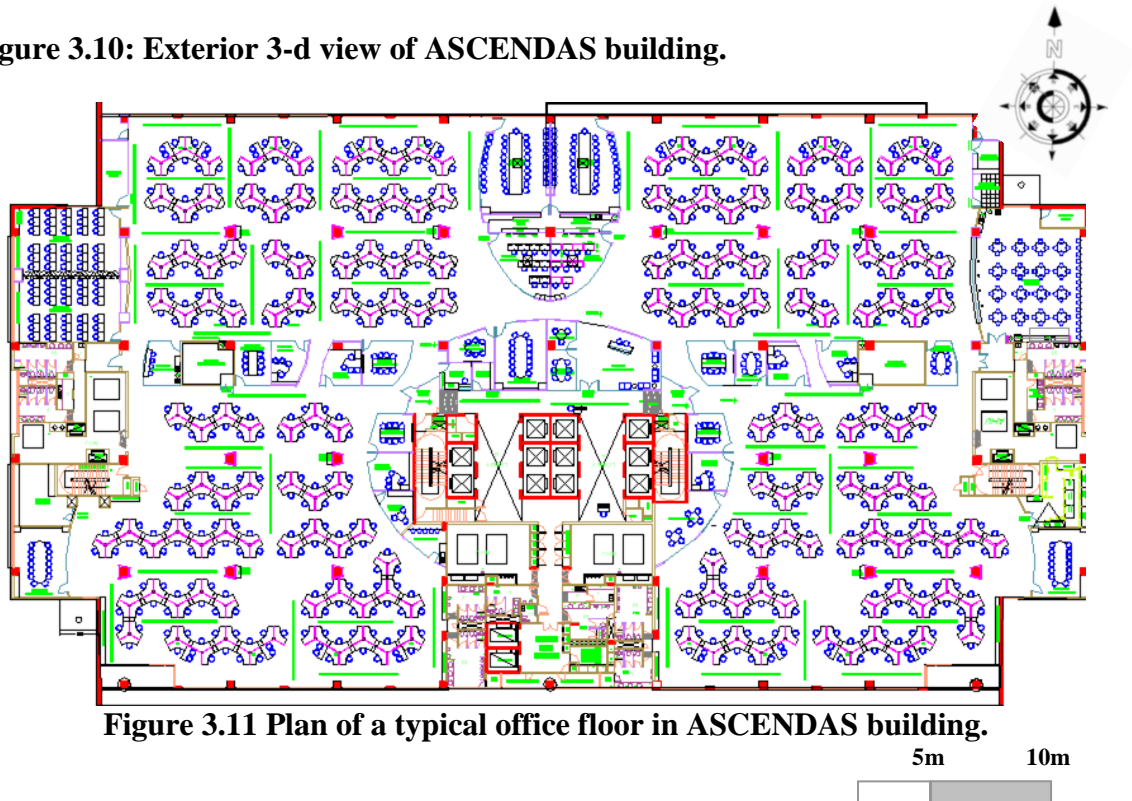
Plan of a typical office floor in ASCENDAS building.
